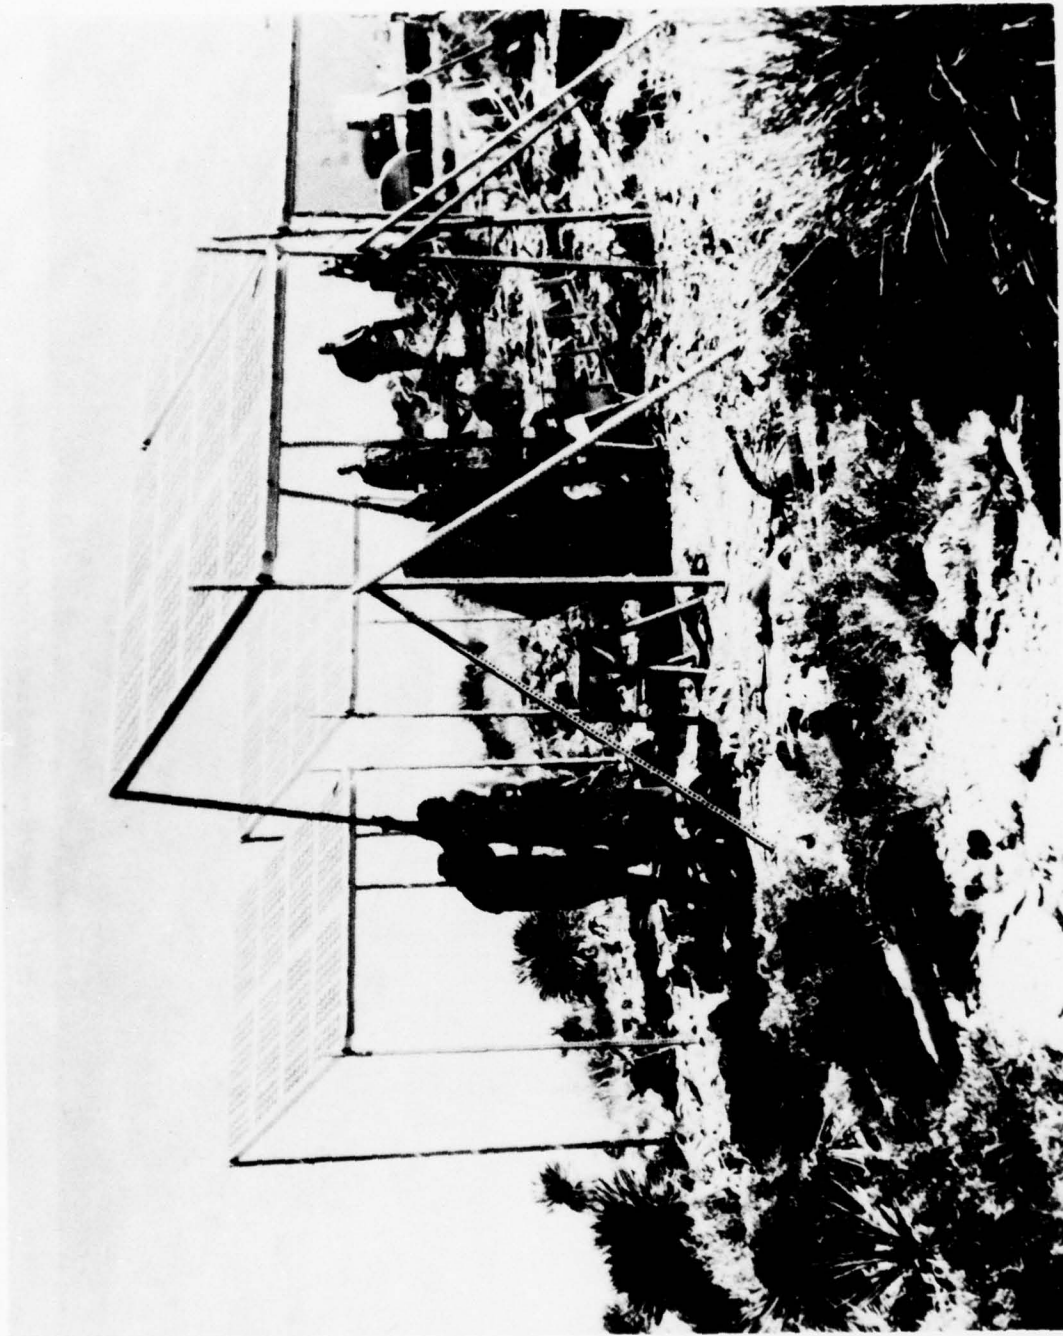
Assembling and installing the solar cell array on Goat Mountain.
